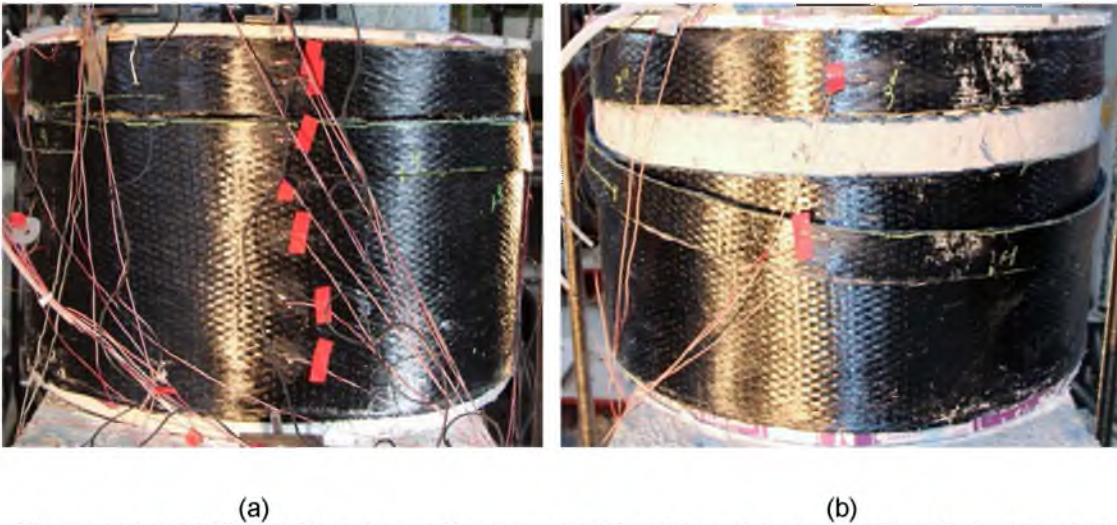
PCLen-3R First Jacket Fracture: (a) West Side of Jacket; (b) East Side of Jacket
